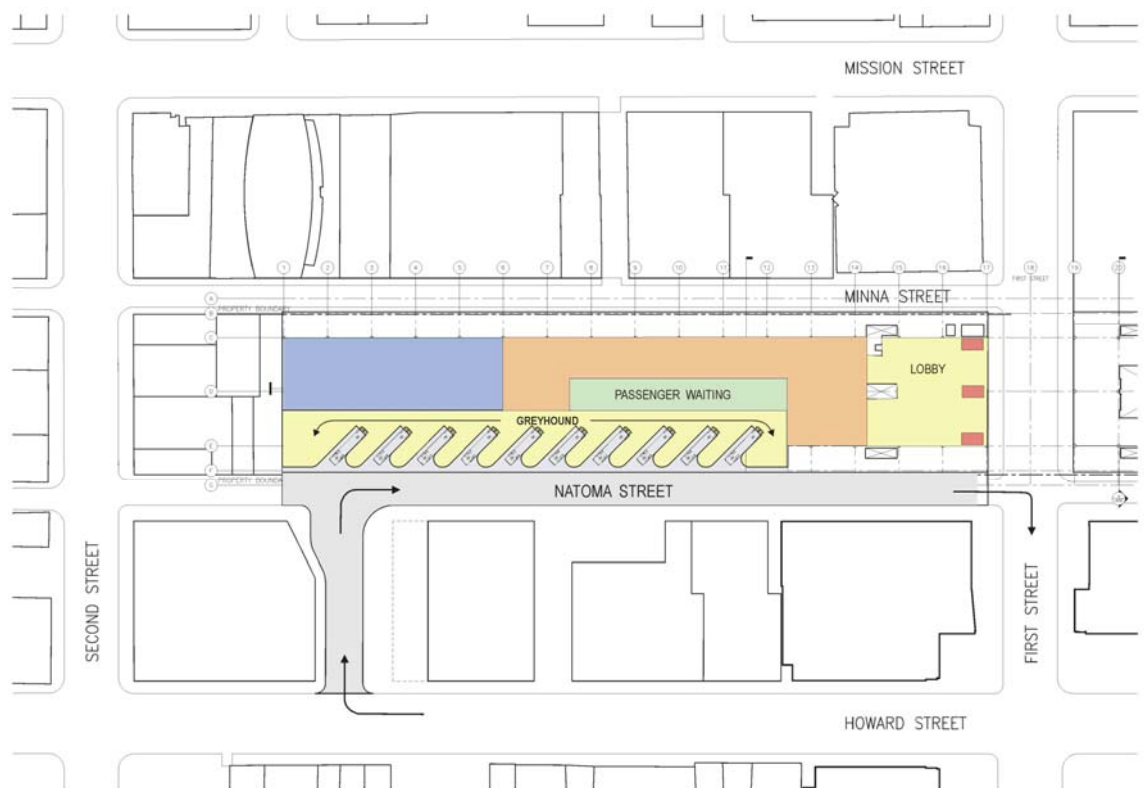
, Greyhound at the West End of the Transit Center Building- Interim Location
